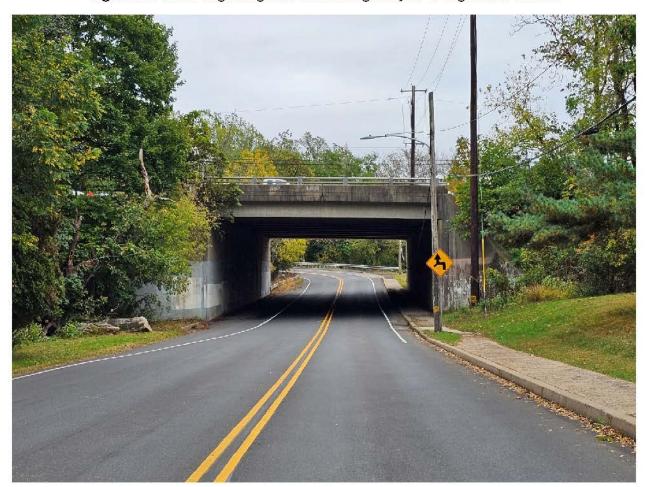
A. Existing Bridge at Lincoln Highway over Highland Avenue
